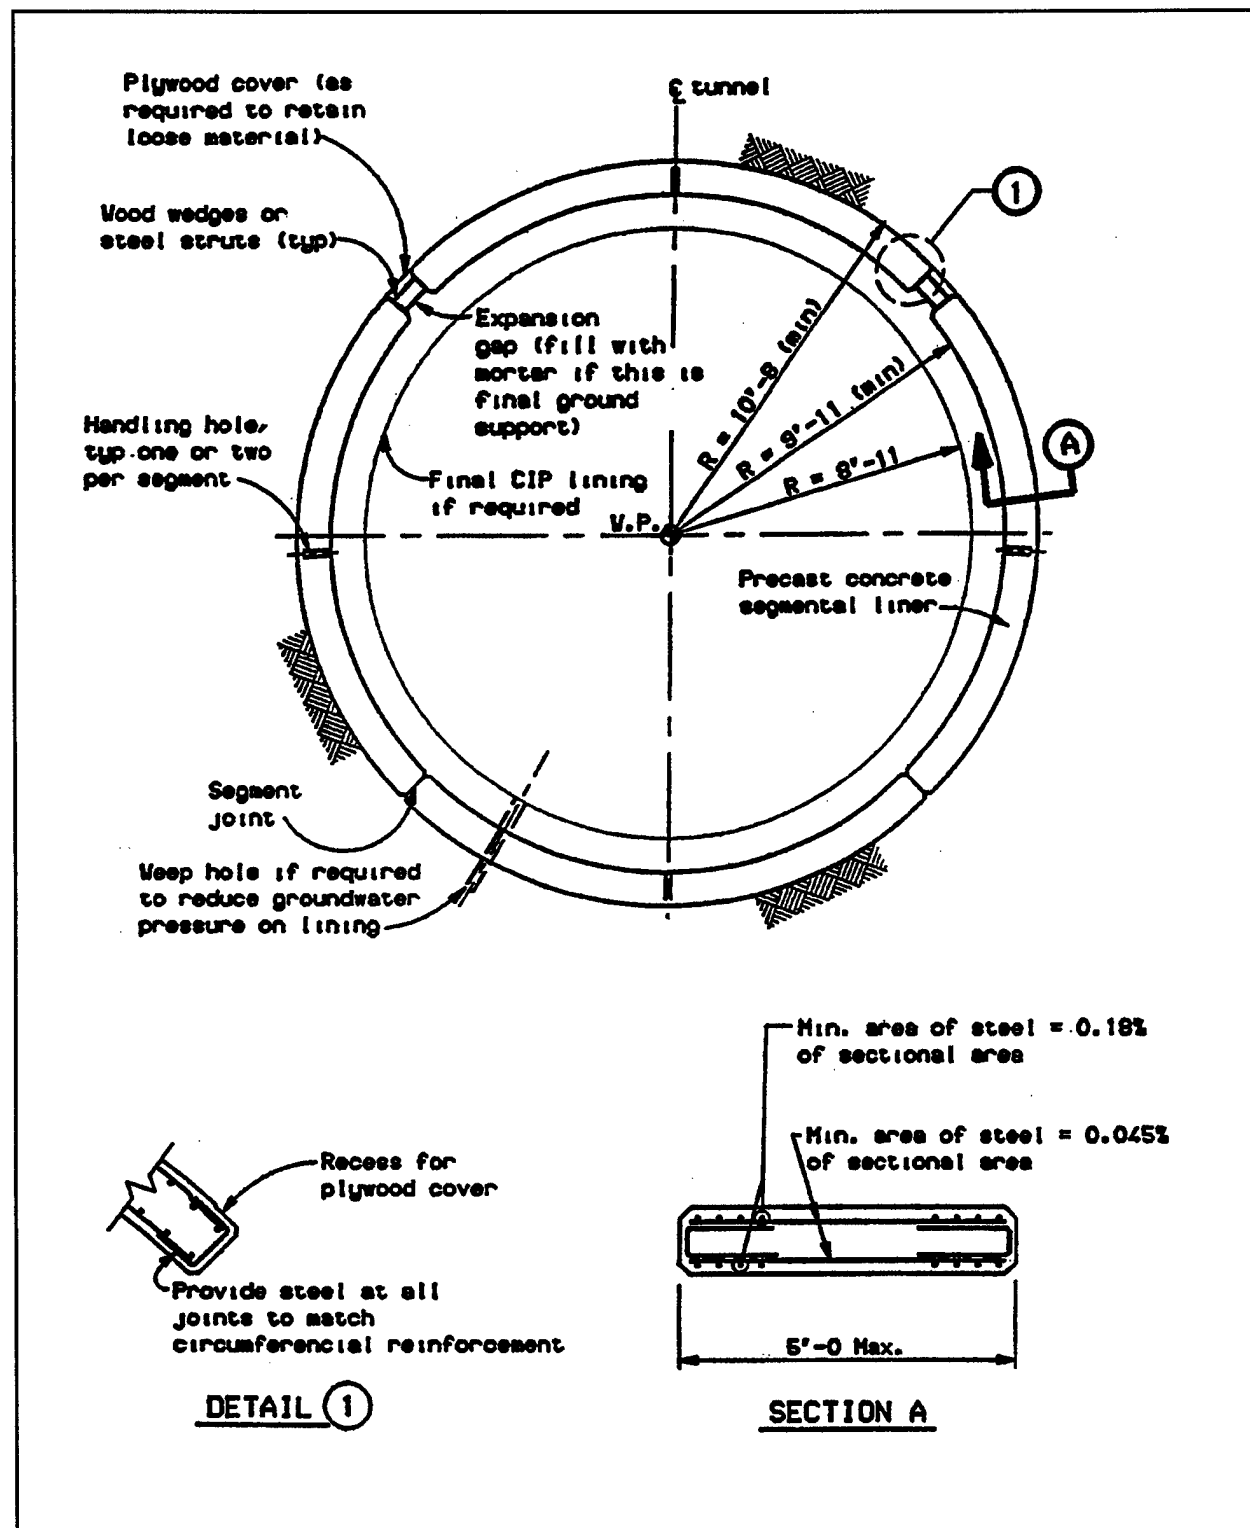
Simple expanded precast concrete lining used as initial ground support or as final ground support
